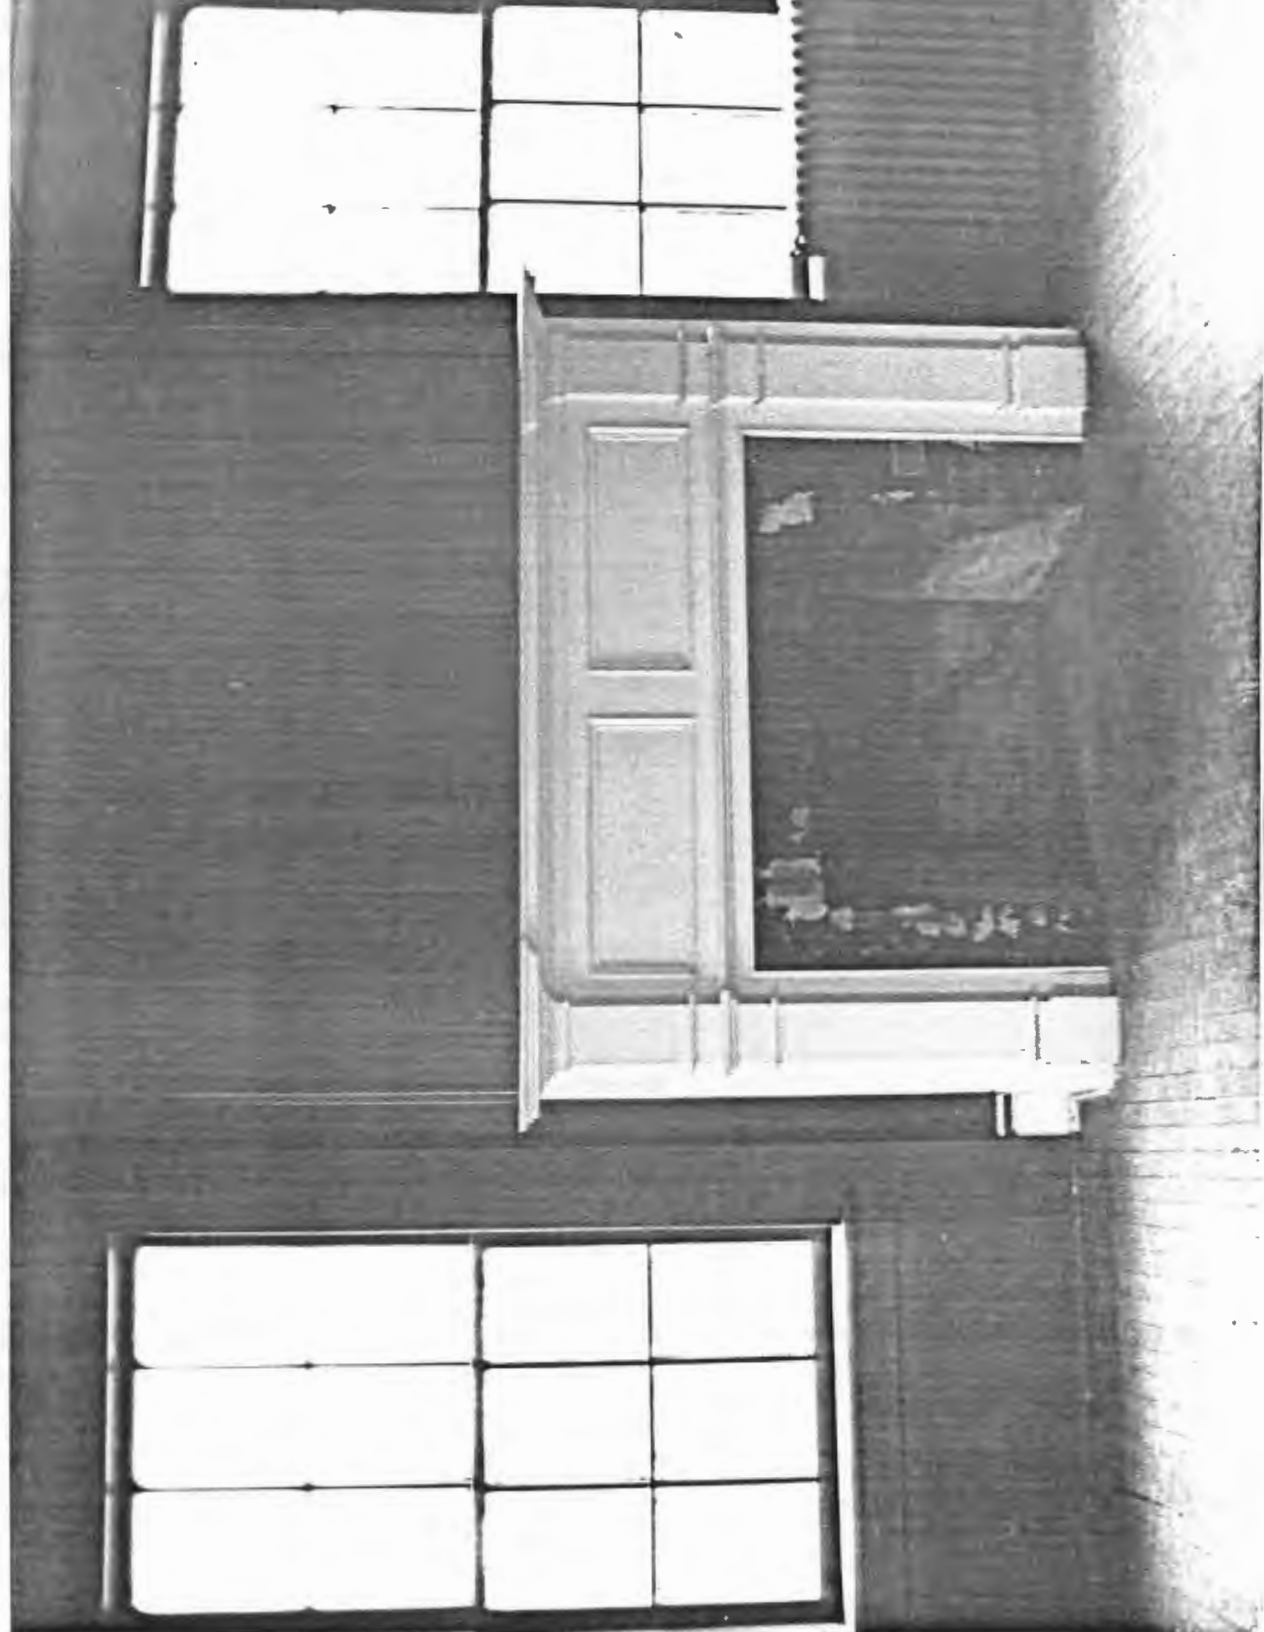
Building 2301, interior view. Although altered, the interior of Building 2301 retains what may be the original mantels, stairway, window and door surrounds, and wood flooring. The fireplace, located in what was the southwest room on the second floor, is one of four major fireplaces in the house. (Source: Field inventory photograph, 1983, Barbara Hightower, Building Technology, Inc.)
